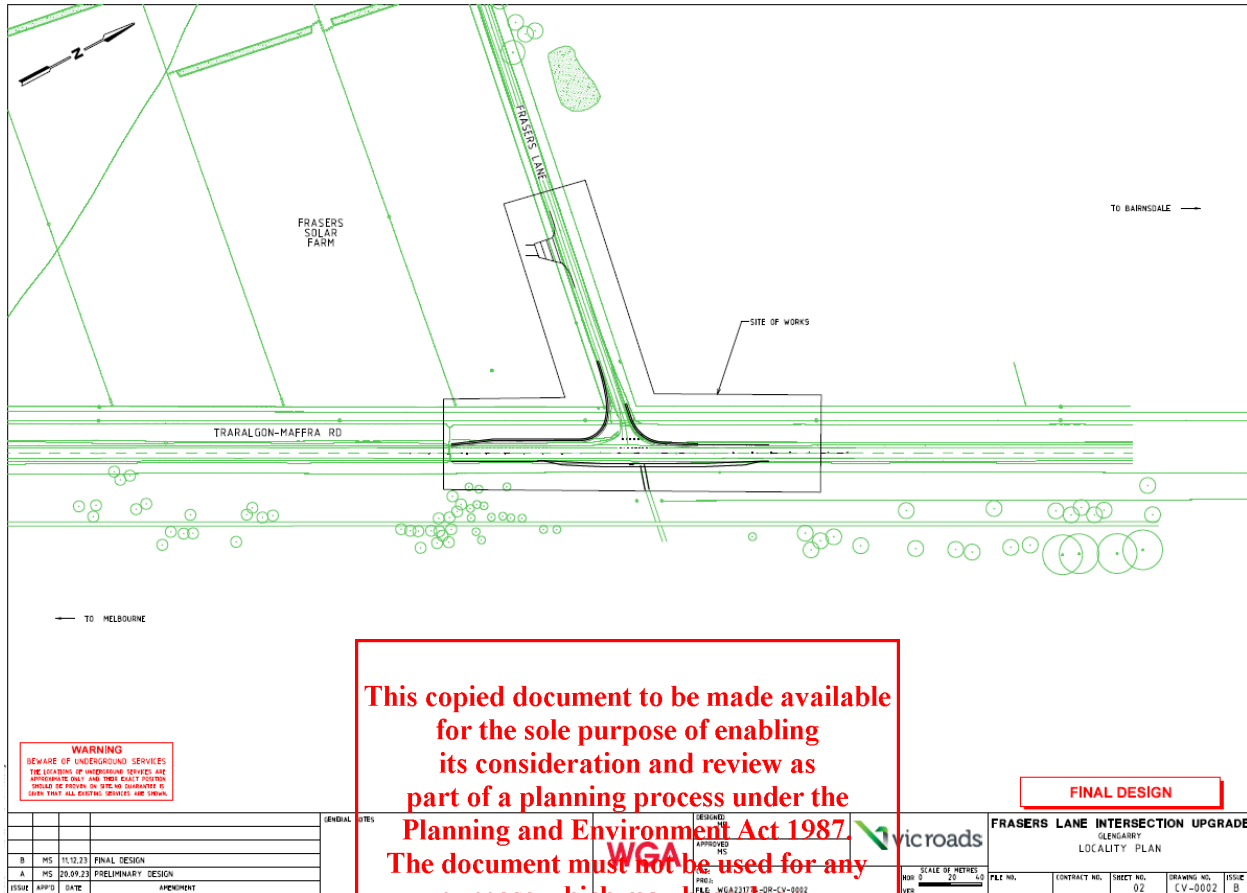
Proposed upgrade of the intersection of Frasers Lane with the Traralgon-Maffra Road (Source: Gransolar Constructions, Sheet 02 of Drawing WGA231774-DR-CV-0002)
